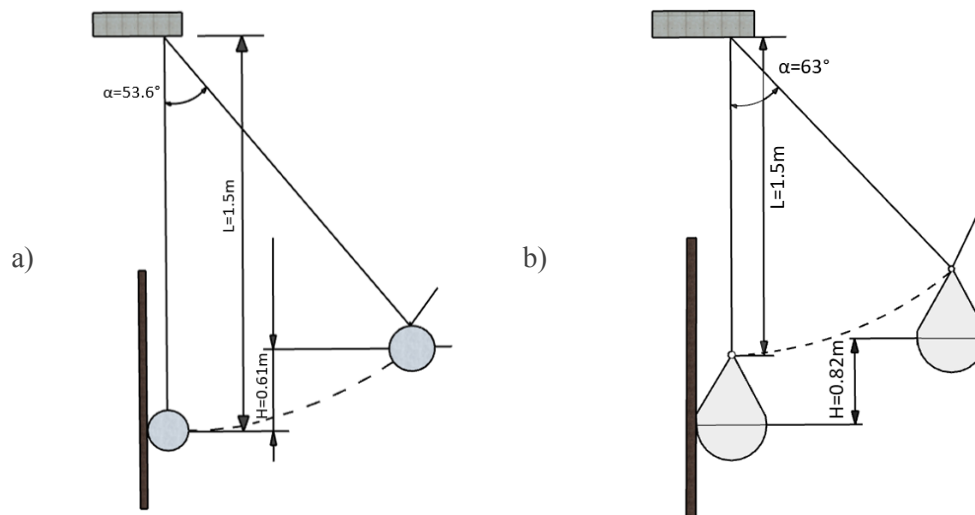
Impact test layout: a) Hard body; b) Large soft body.
